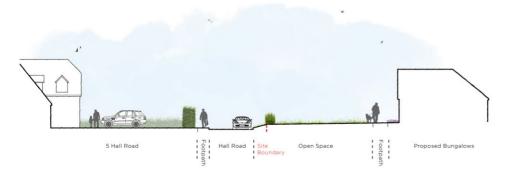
Proposed Section Between Development and Hall Road
